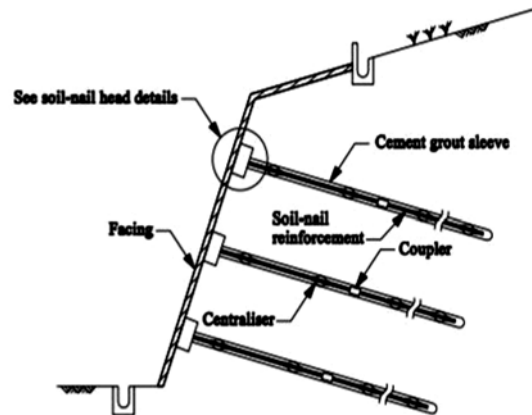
Cross-Section of Soil-Nailed Cut Slope
